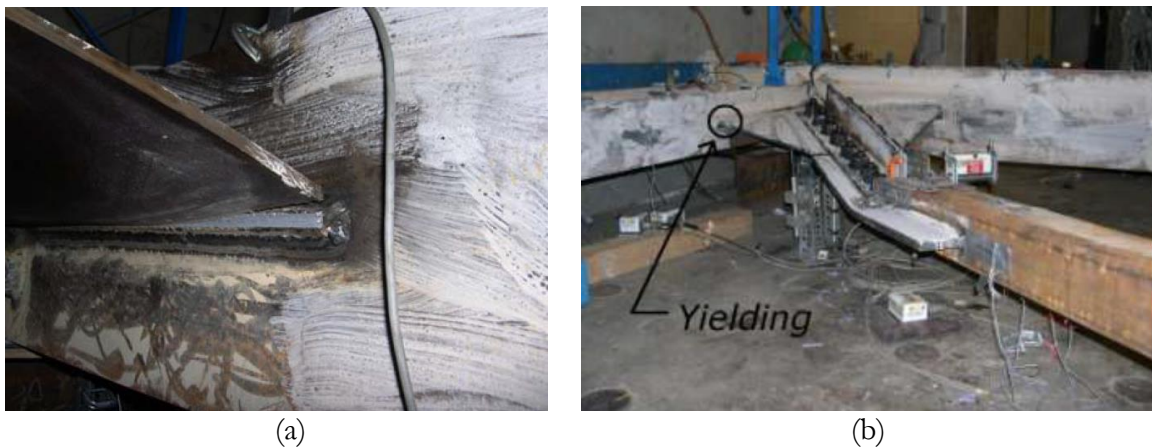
Bolted gusset failures: (a) Single splice (Kotulka 2007) (b) Two WT sections (Powell 2010)
